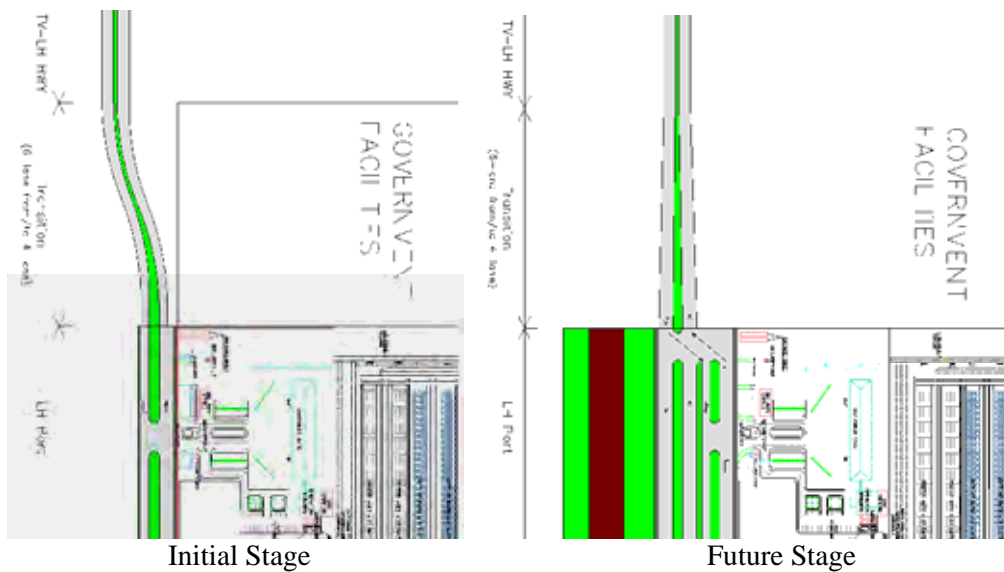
Connection Portion Detail of Port Road and Cat Hai Access Road (2015 & Future)
